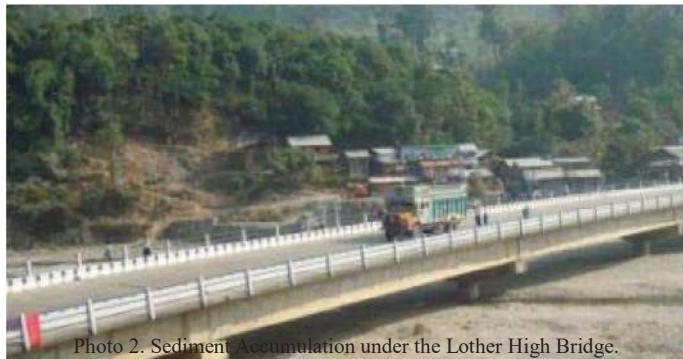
Sediment Accumulation under the Lothar High Bridge.
